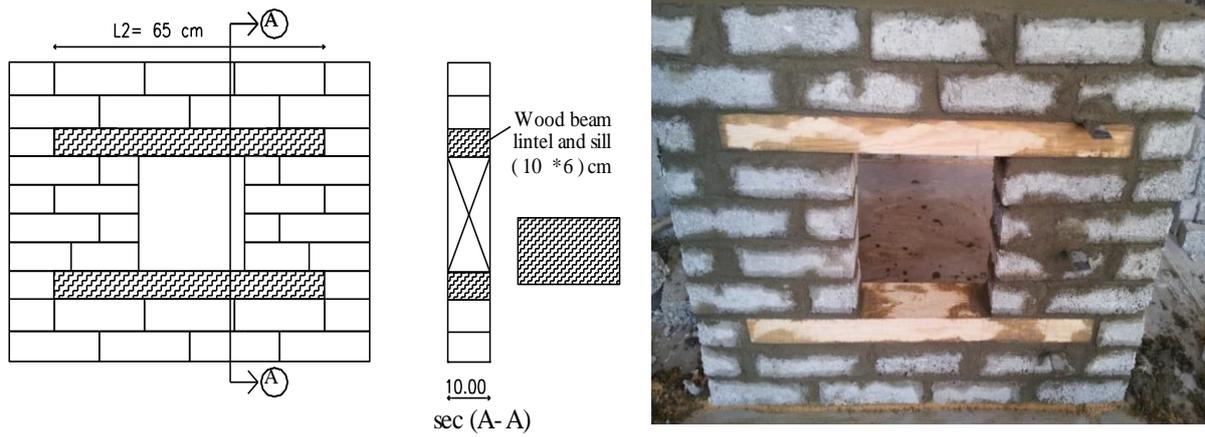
Details of strengthening brick walls with opening using wooden beam at lintel and sill with (L0, L1, L2) (all dimensions with cm)
